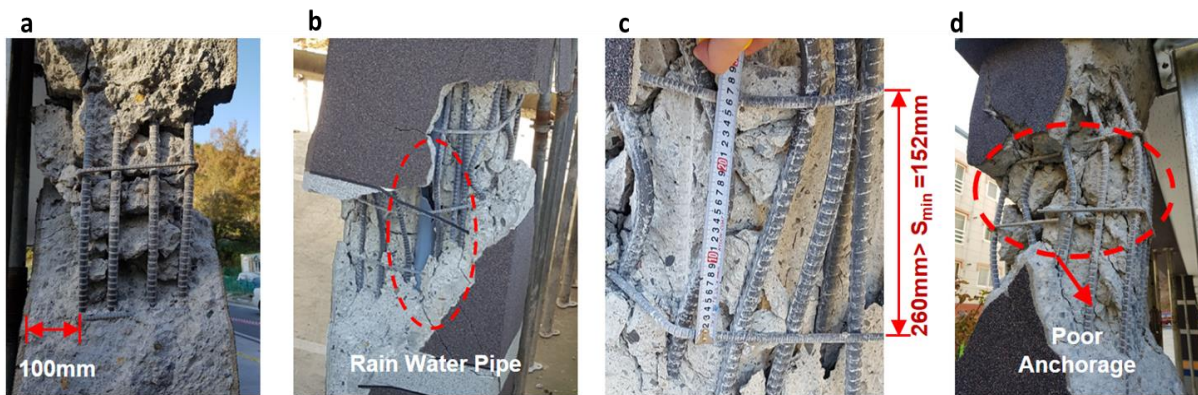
Examples of Column Failures of Piloti Structure in Pohang, Korea: (a) excessive concrete cover; (b) inclusion of rain water pipe; (c) inappropriate spacing of ties; (d) poor anchorage of ties (non-appliance of hook detail standards)
